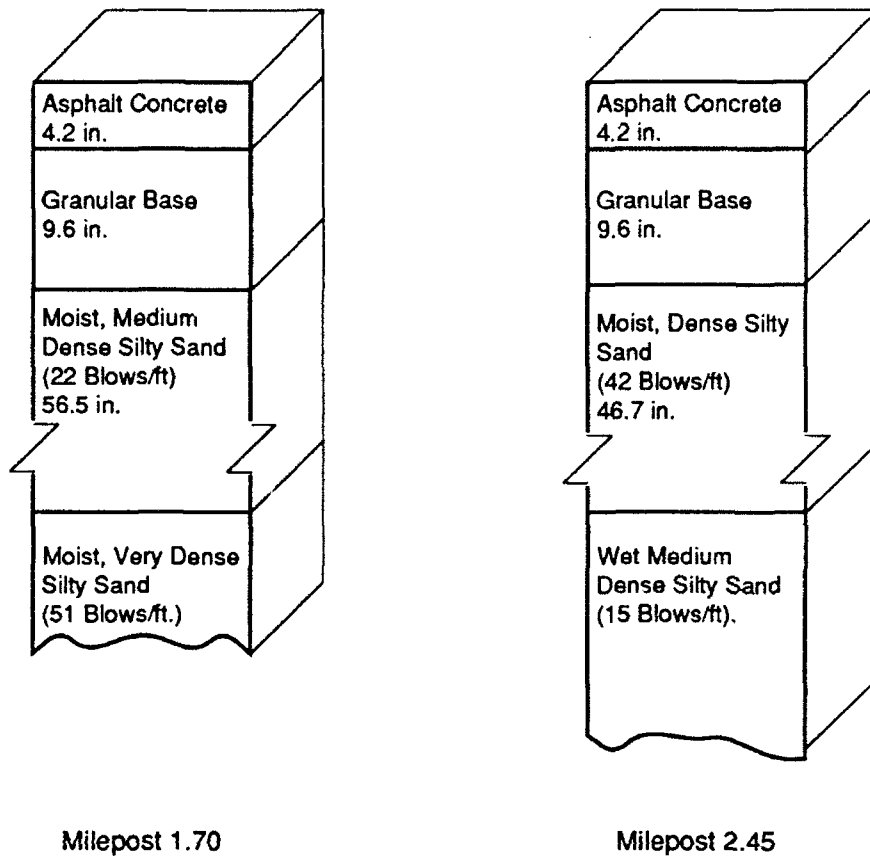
Cross-sections for SR 525 Pavement Sections, MP 1.70 and 2.45 [17]
